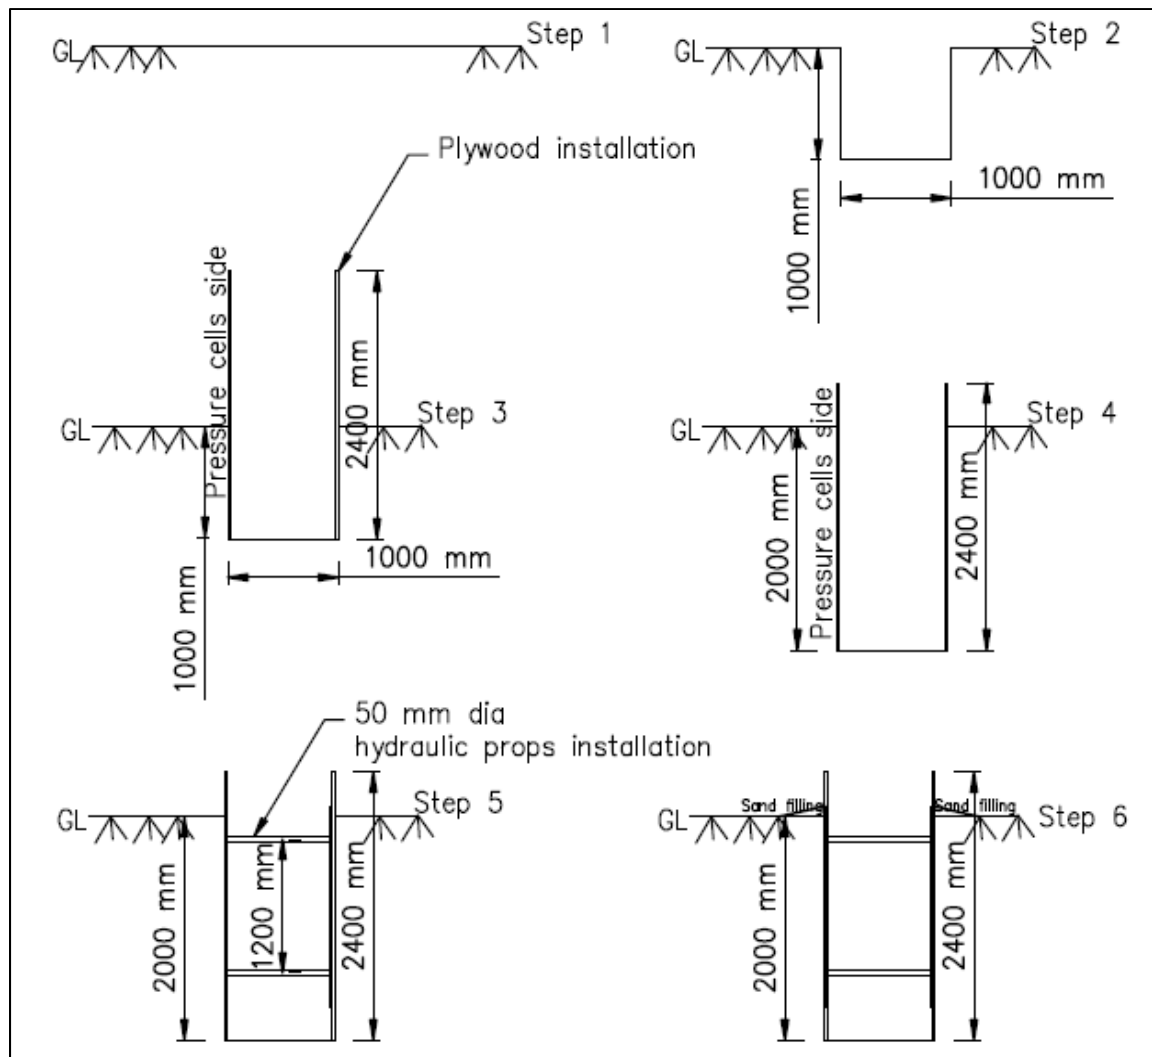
Excavation / Construction sequences for Hydraulic shoring with Ply wood sheeting in a trench
